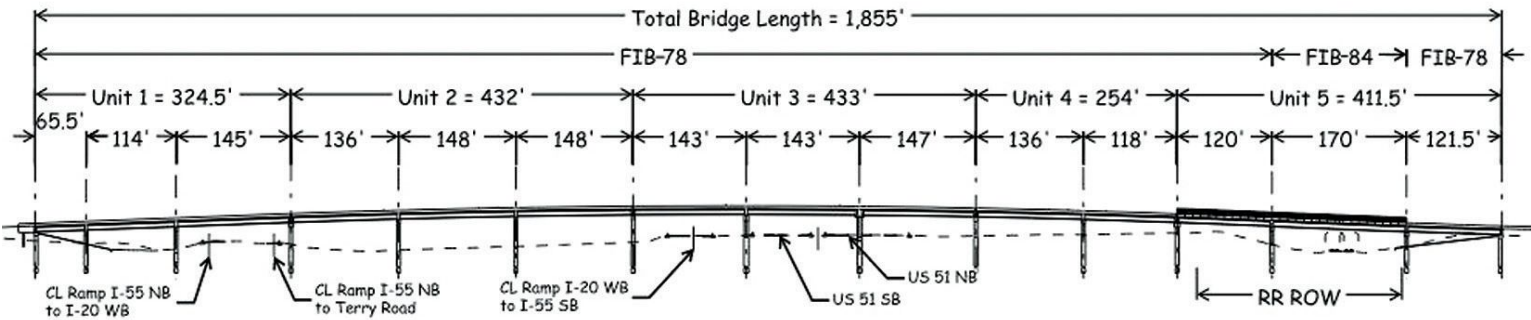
Value-engineered solution with prestressed concrete beams. Span 1 is at the west end (left).
